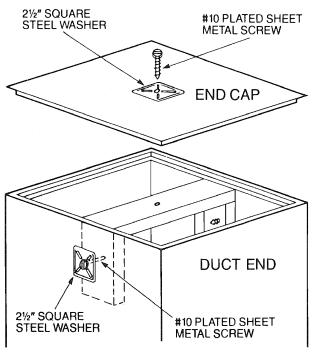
END CAP REINFORCEMENT INSTALLED
